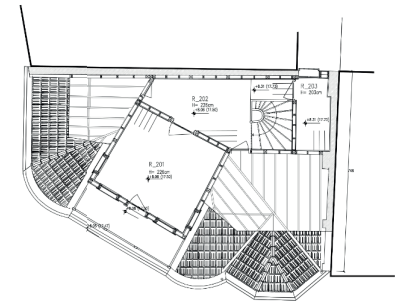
Basemet floor plan of the restitution project. Rearranged by the author based on the drawings of N. Unal, 2014.
